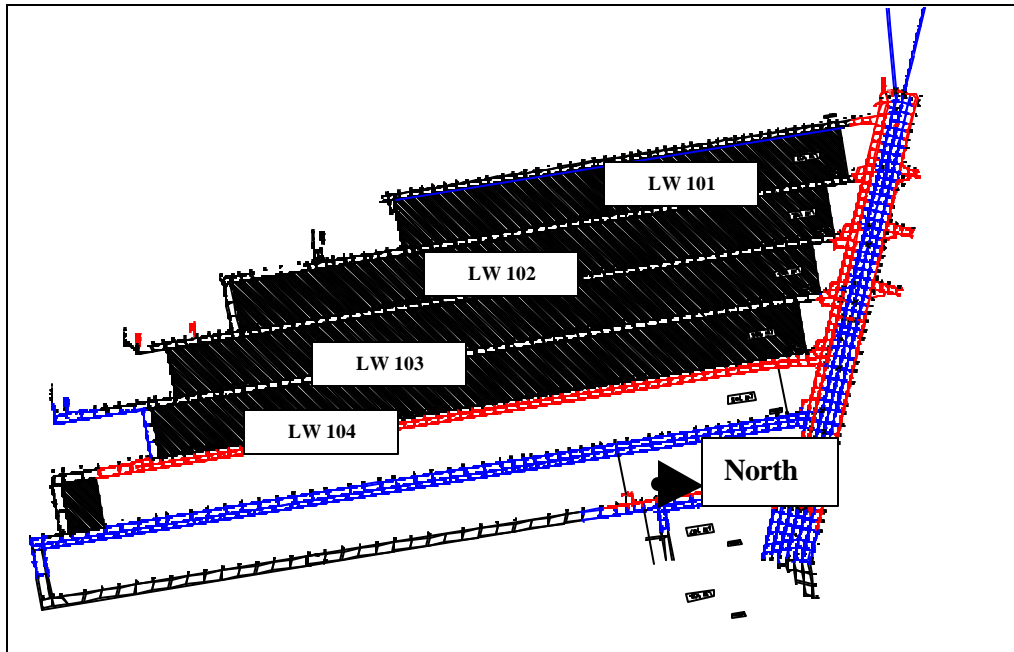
Moranbah North 100's series longwall panels (101 – 104 shown hatched / longwalls extracted to date).
